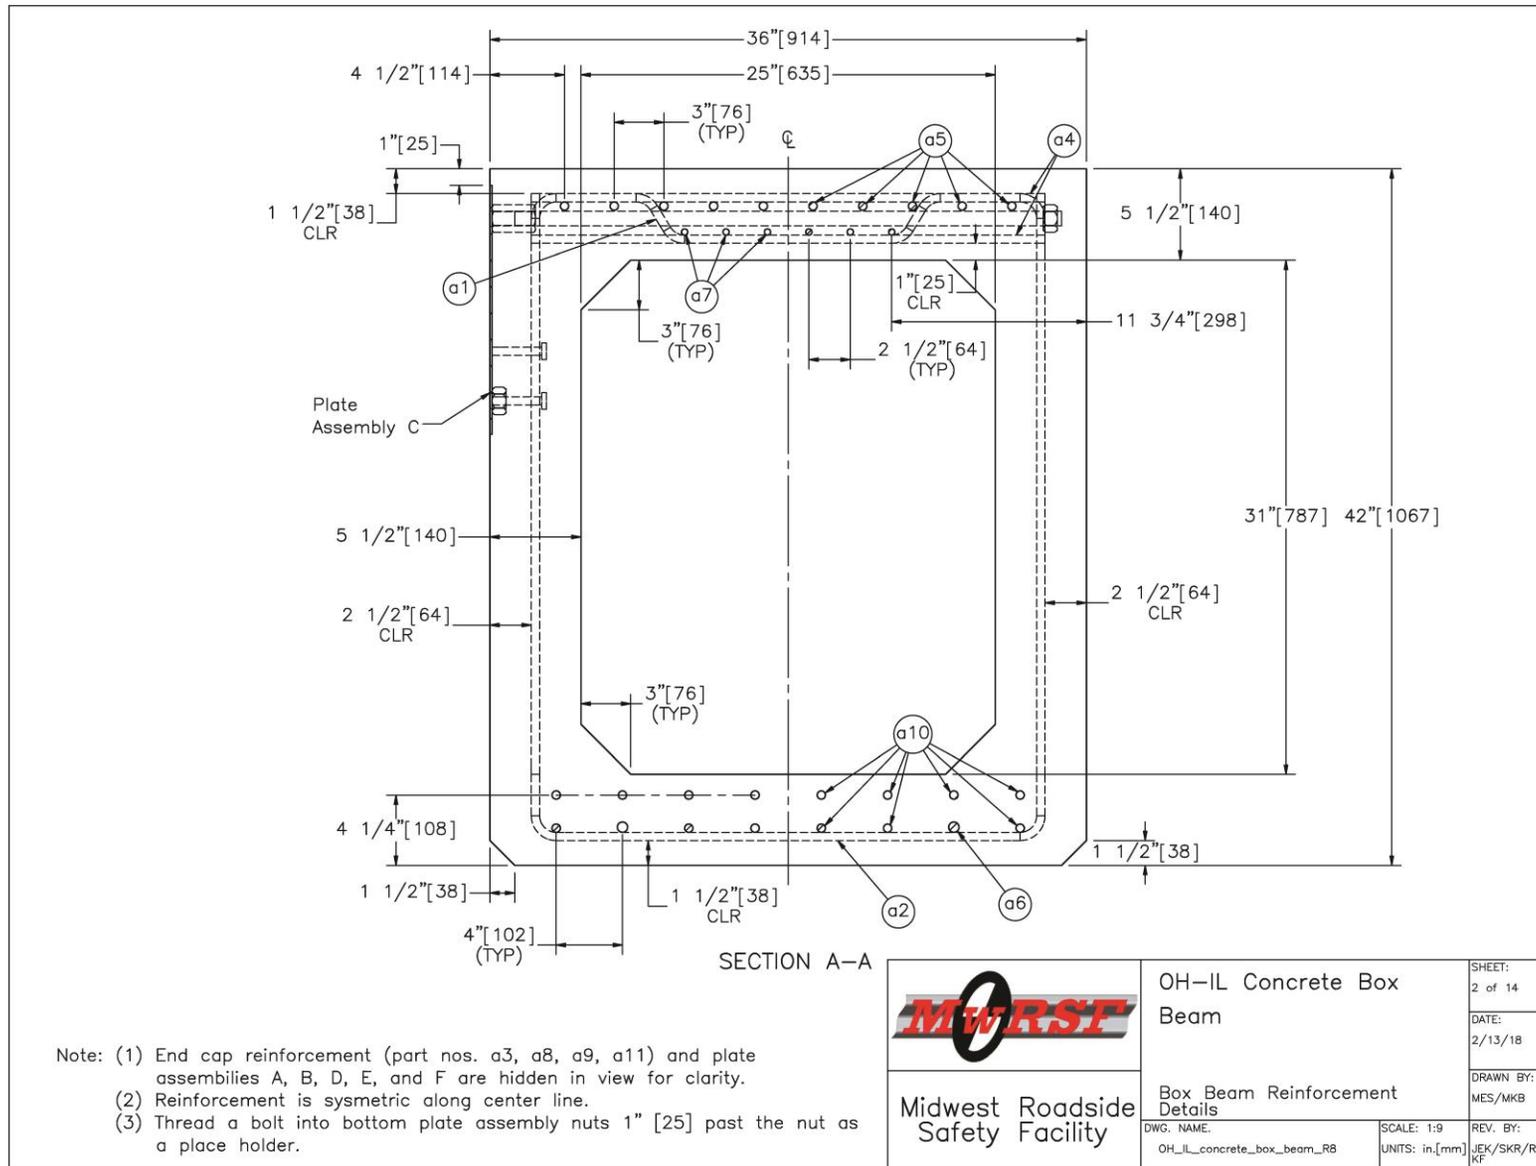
Critical Concrete Box-Beam Girder Reinforcement Details for Hollow Core Section
